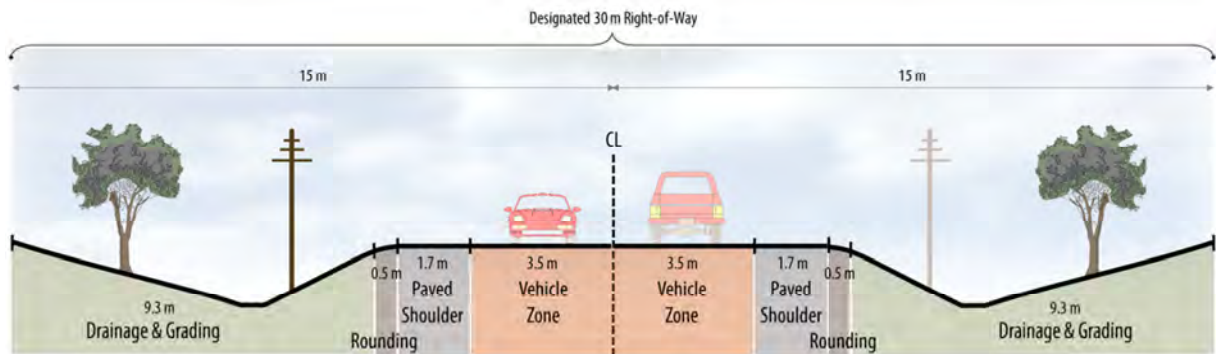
11.4 m Platform Rural Cross-Section for Bush Street
